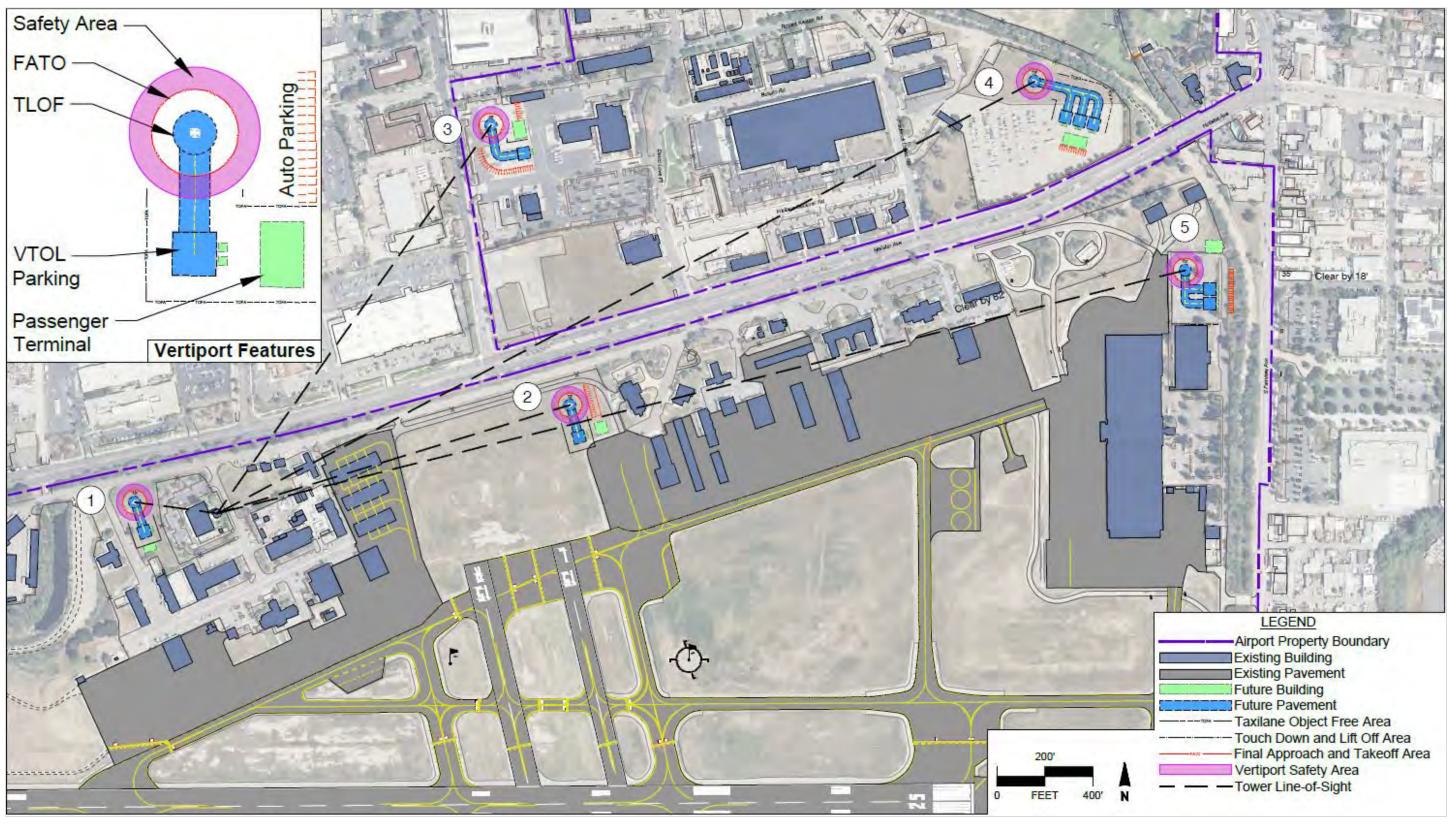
Site 1 – Located immediately west of the existing Airport Traffic Control Tower (ATCT)
